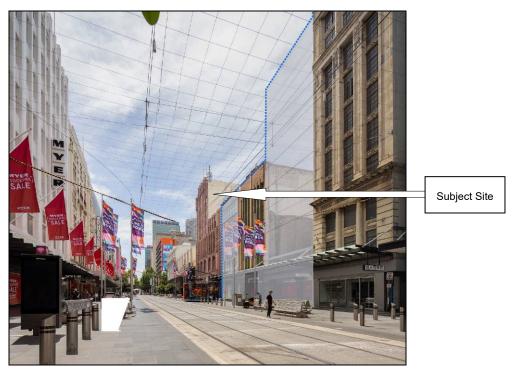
Subject site (Bourke Street) demonstrating concealed additions
